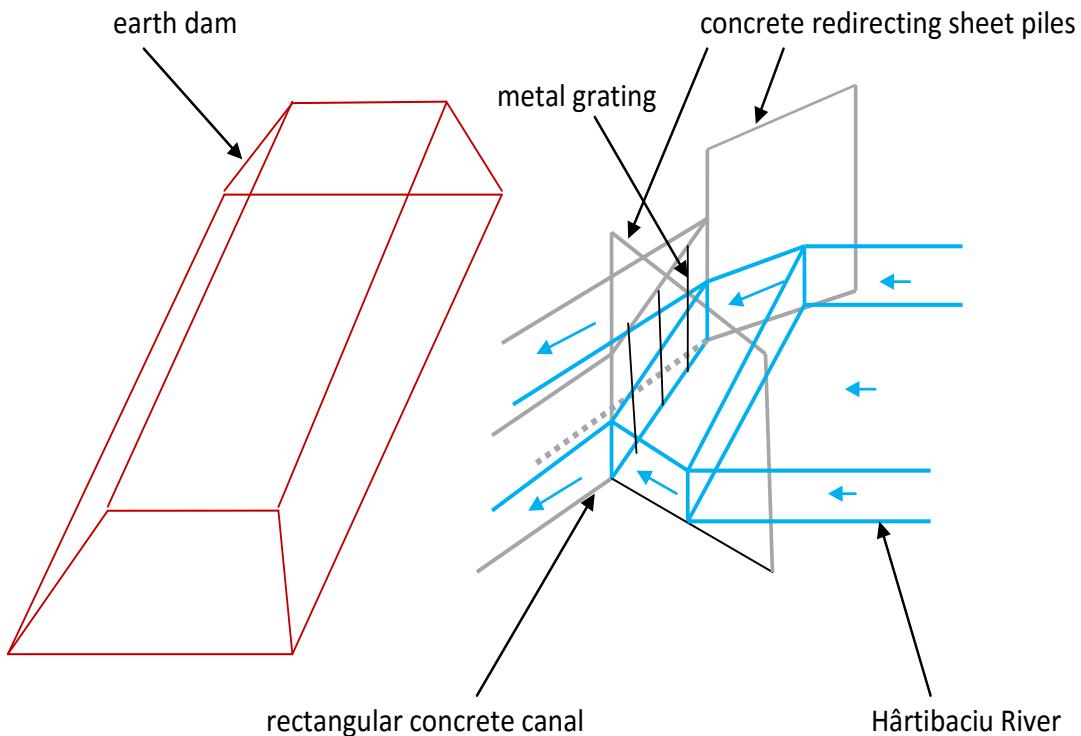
Positioning the rectangular concrete canal – indicative scheme.
